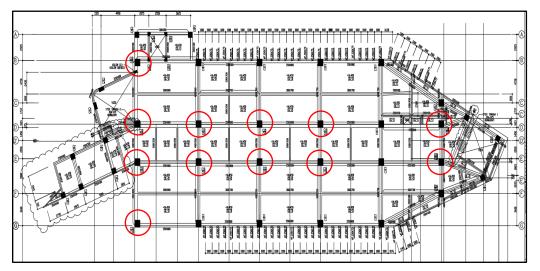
Floor Plan 5 of Ipeka BSD Christian School Project Phase 3
